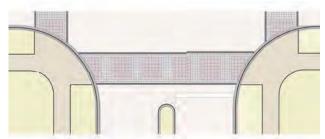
Crosswalk Option C, concrete Unit Paver or impressed concrete
